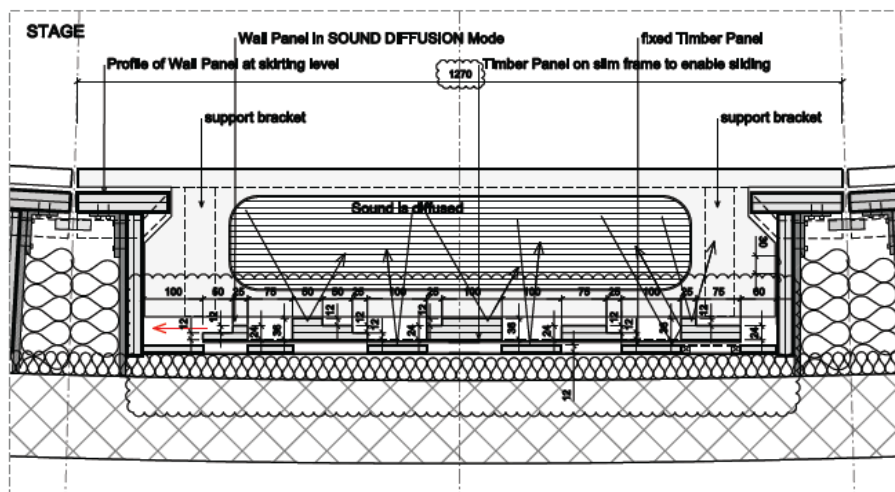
Plan of sliding slat arrangement on platform surround (diffusing mode)
